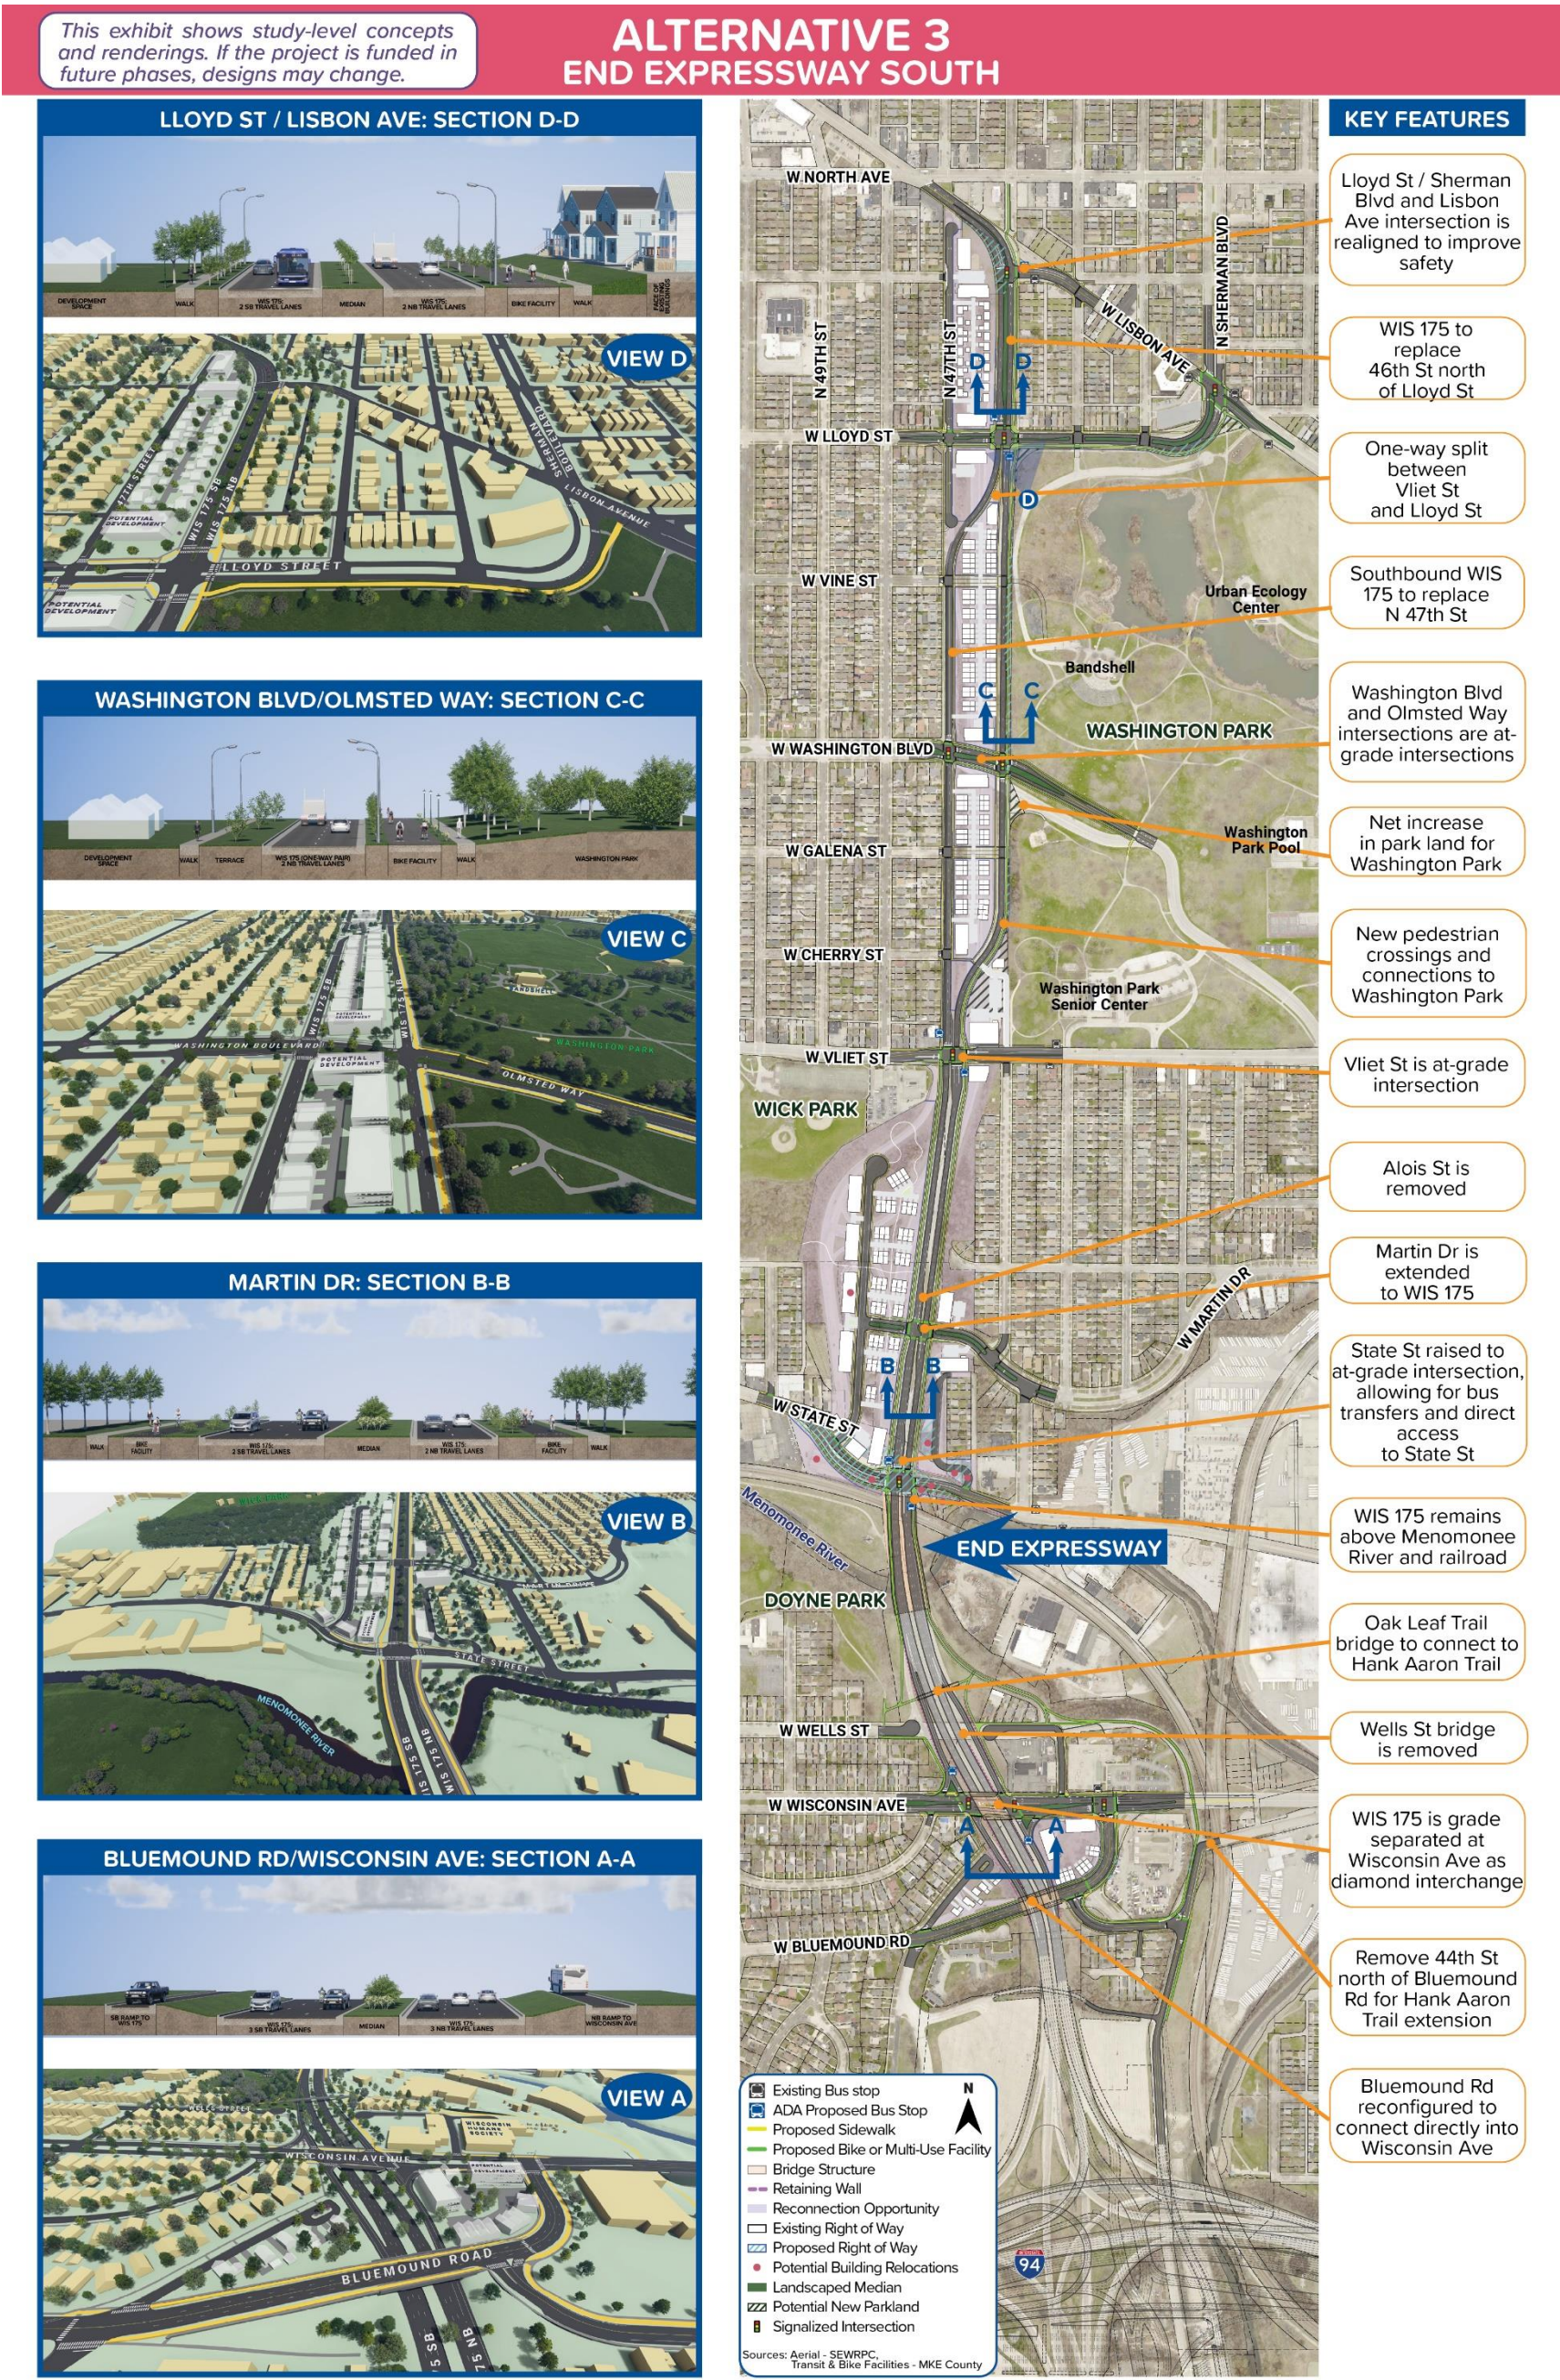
WIS 175 | Alternative 3 | Detailed plan view
